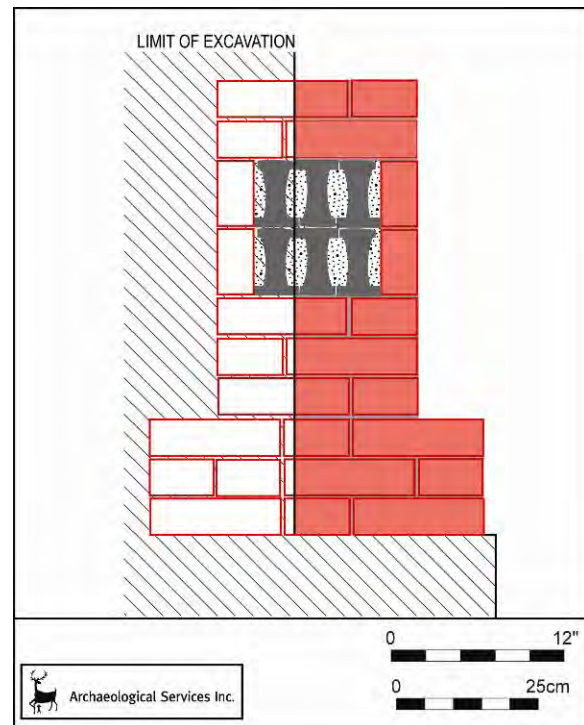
Schematic drawing of the construction of the wall footing partially exposed along the west edge of the Pedestrian Bridge excavations.
